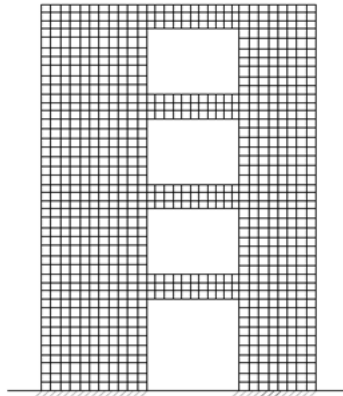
Finite Element Model of a Coupled Shear Wall
